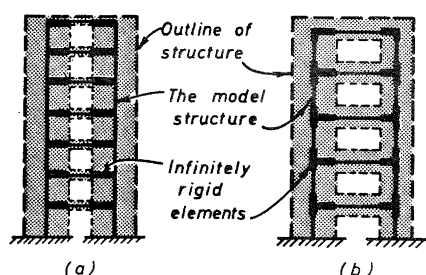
THE MODELLING OF COUPLED STRUCTURAL WALLS
